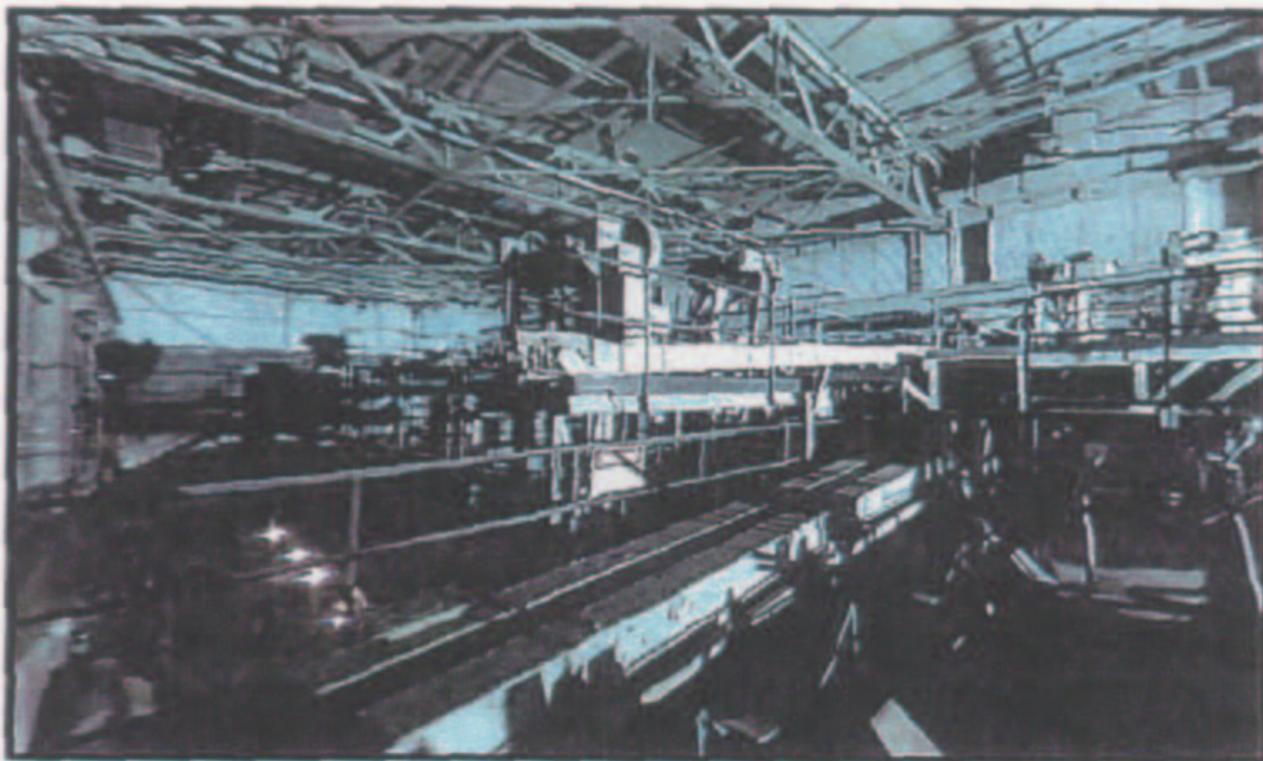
Interior view of the 2nd Floor of the West Expansion Tower of Building C-410.
